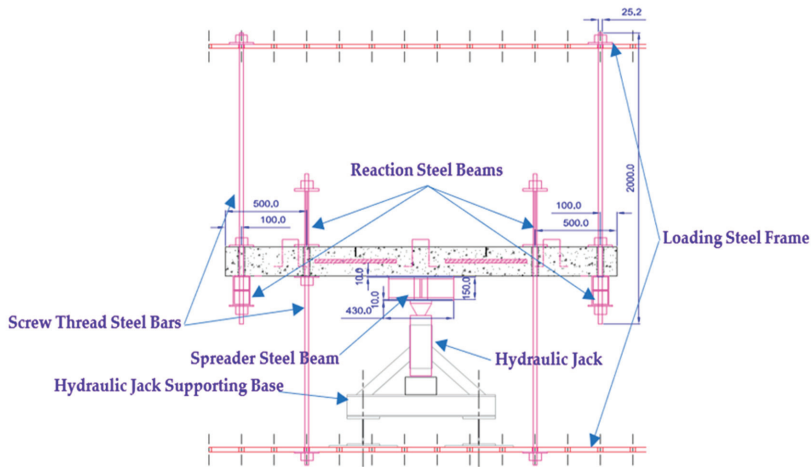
Close up of Shear Strength Test Set-up of the Concrete Slab Specimen.
